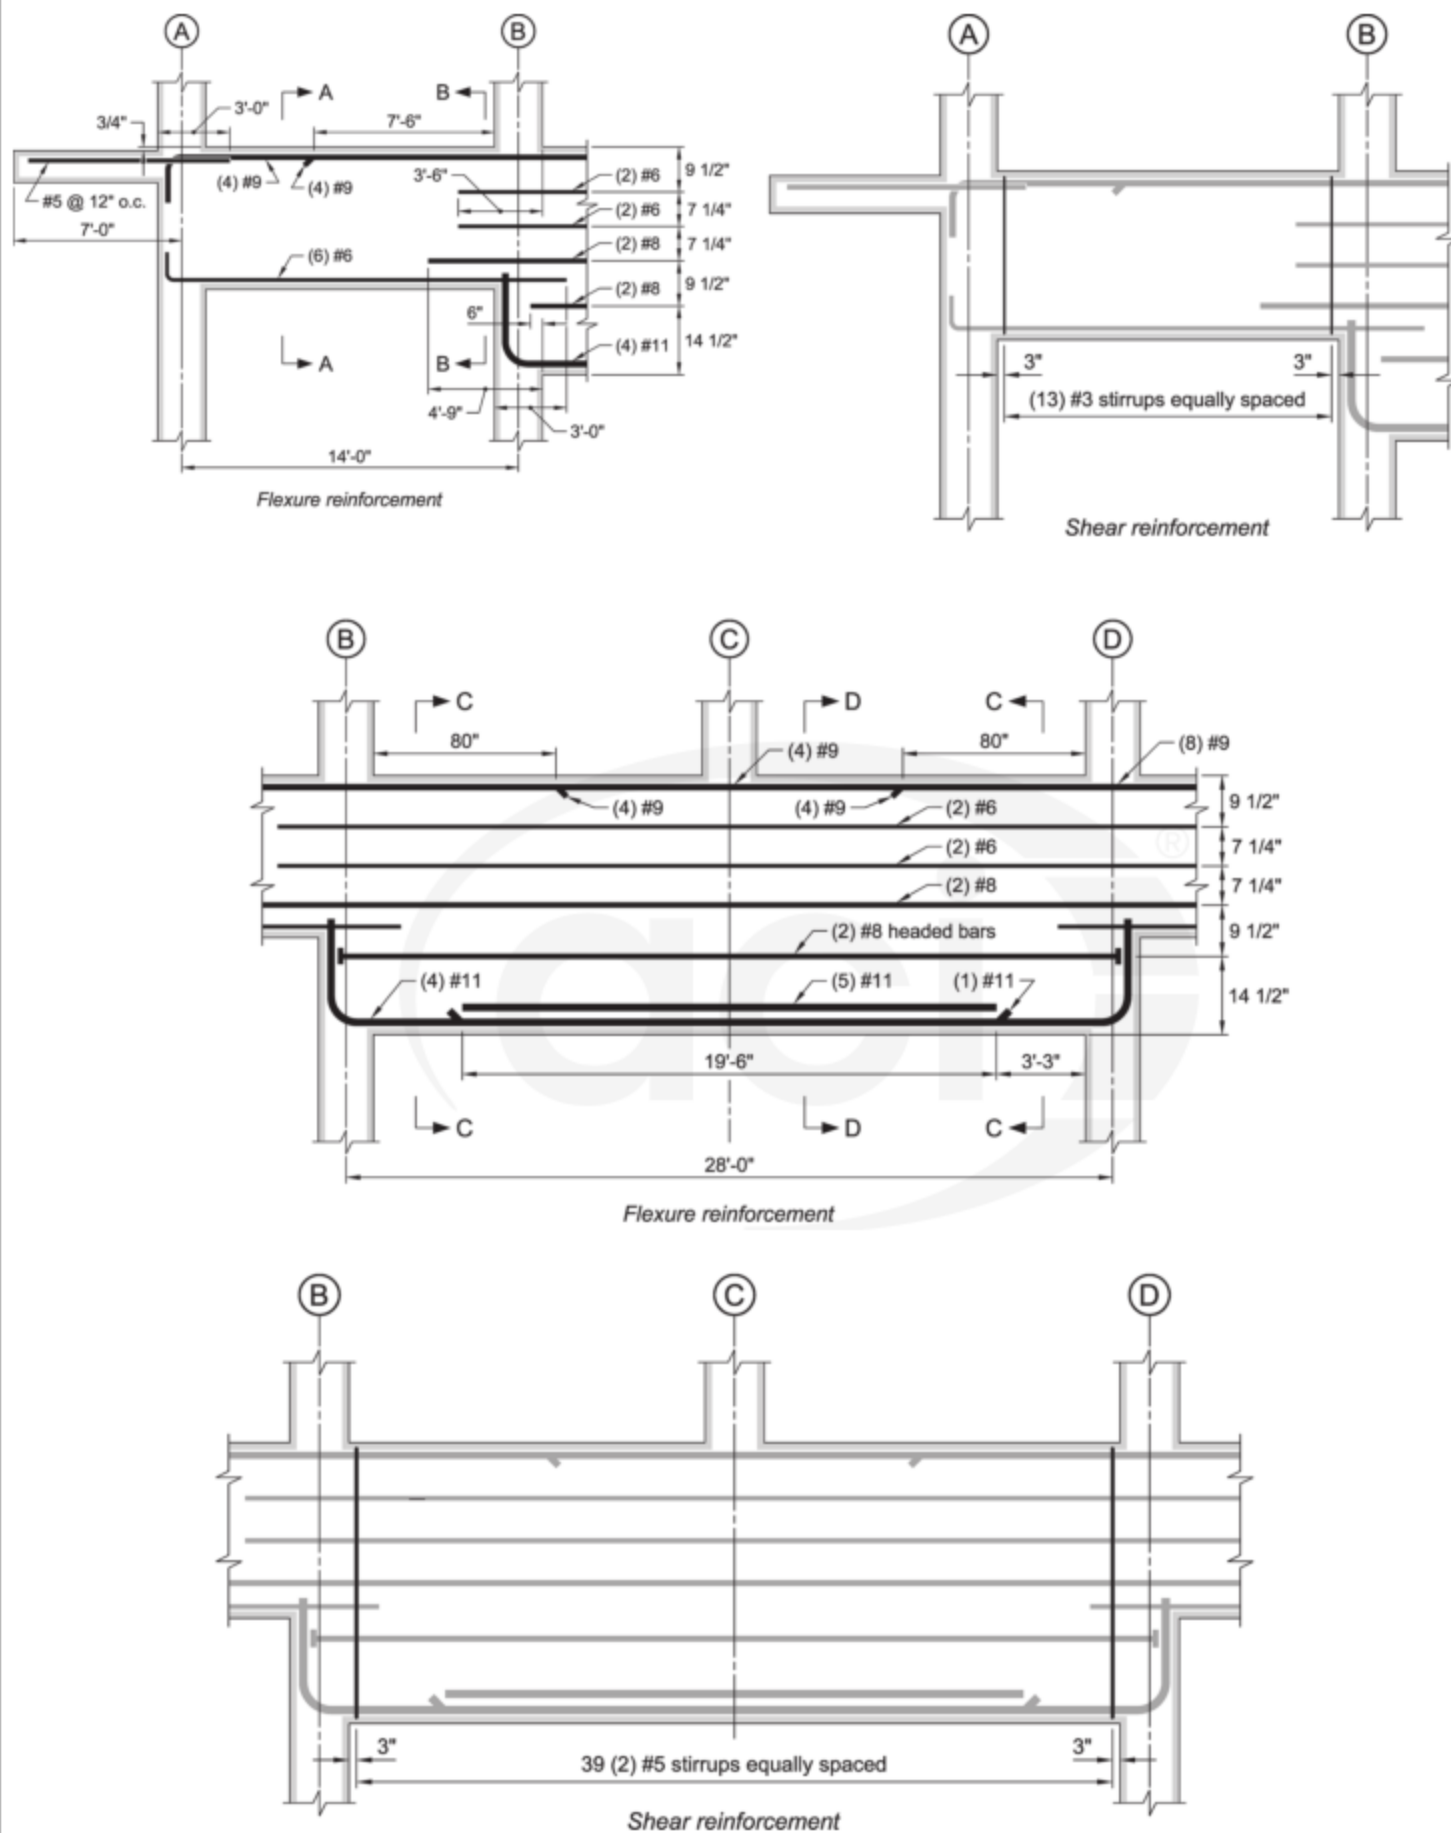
Beam bar details. (Note: Figure continued on next page).
